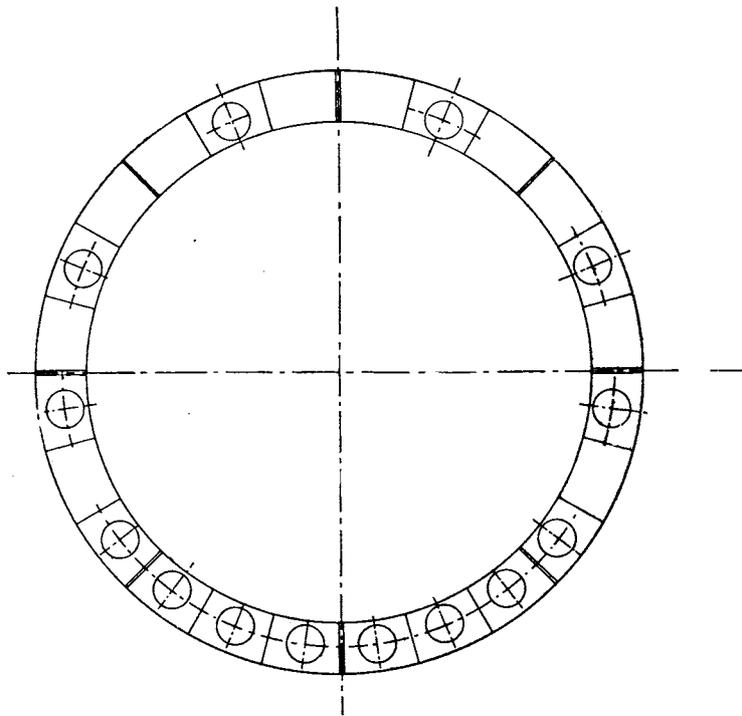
BAKER STREET AND WATERLOO RAILWAY, LONDON.
